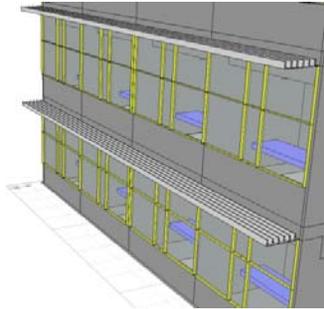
Overhang Baffles on 2/3 WWR Storefront Window System
